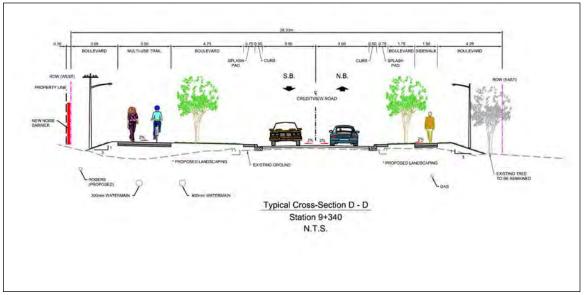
Creditview Road Class EA, Preliminary Preferred Alternative: Typical Cross-Section D-D at Station 9+340 [AECOM, 2015].
